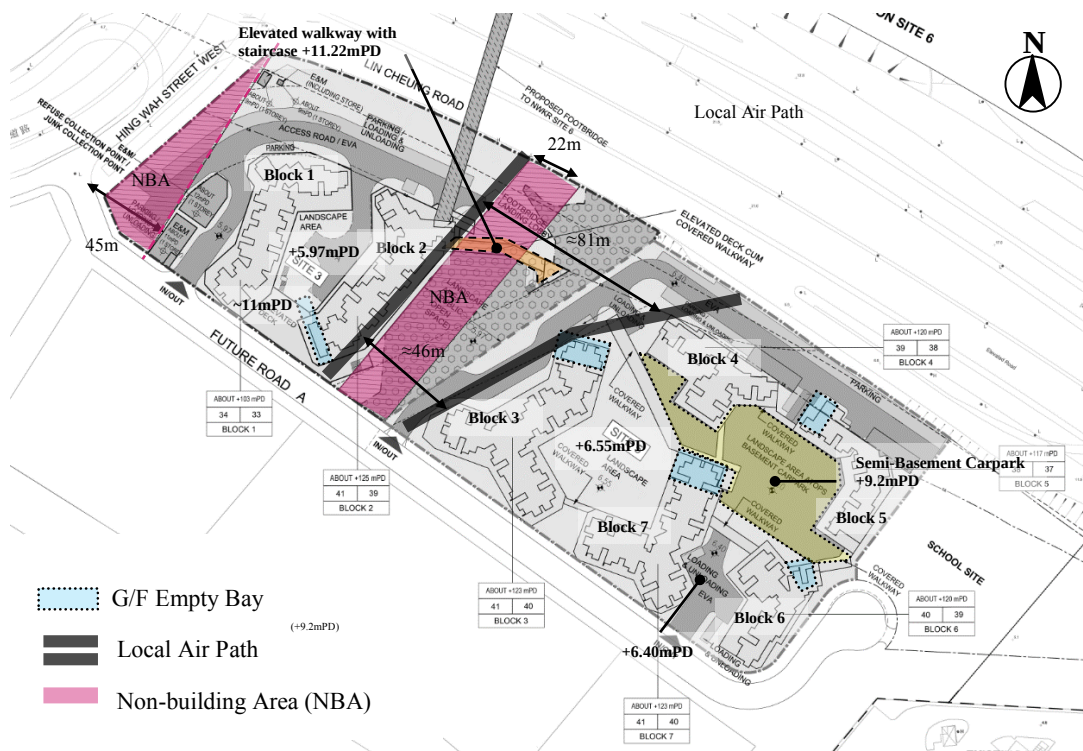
Master Layout Plan at G/F of Proposed Scheme for Lin Cheung Road Sites 3 & 5
